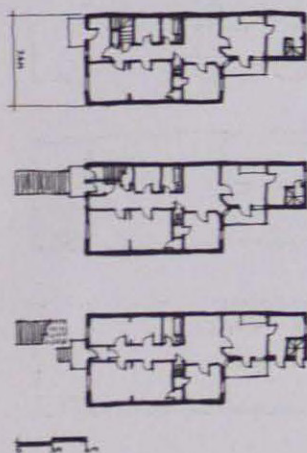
Typical triplex dwelling, one flat per storey, L-shape plan. Adapted from Marsan, *Montreal in Evolution*, 277.
